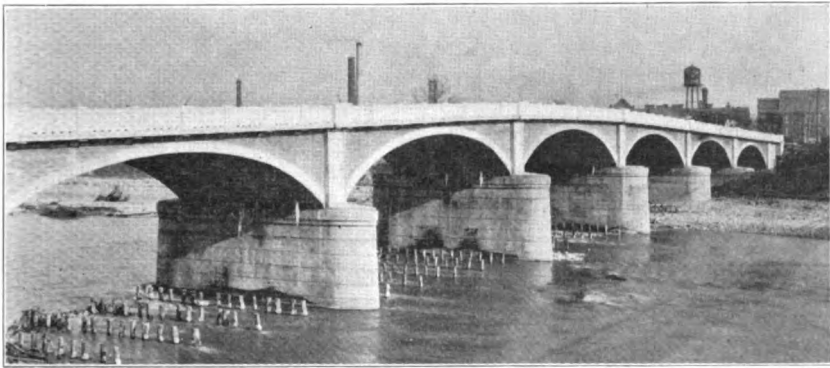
BLACK STREET BRIDGE AT HAMILTON
